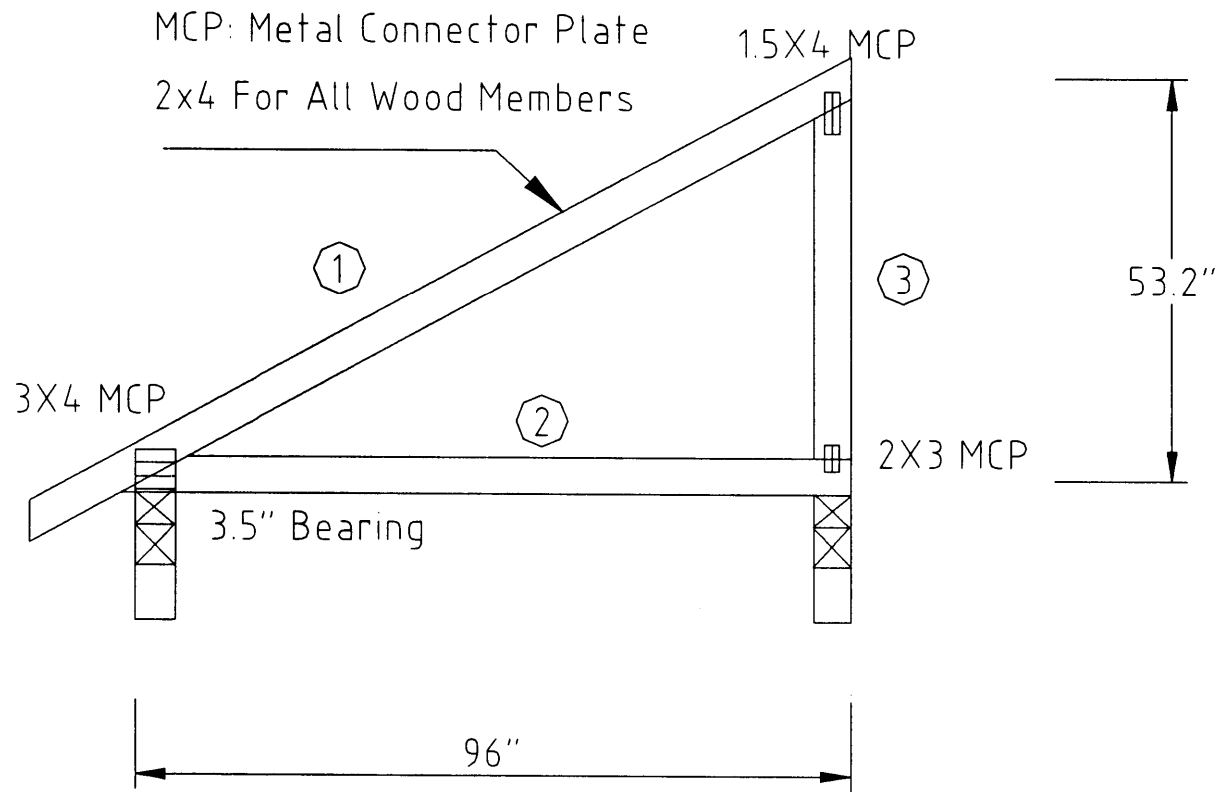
MPC Truss Type J from a Truss Plate Manufacturer
